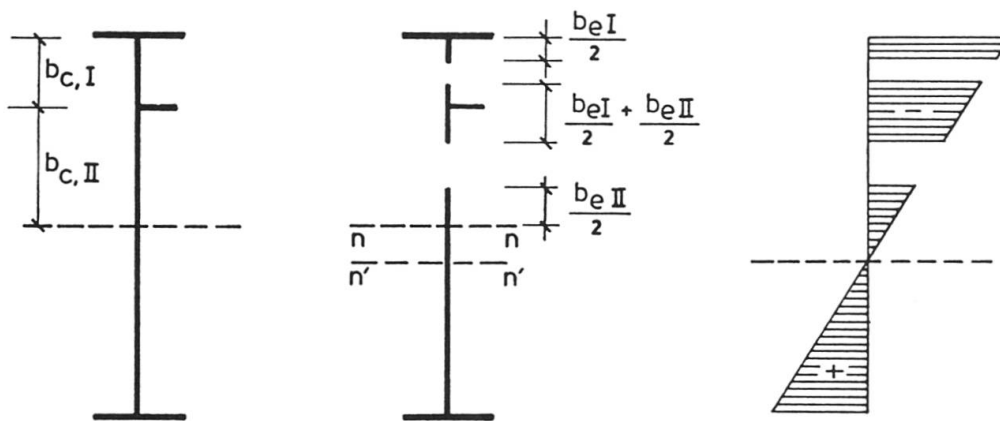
Effective width model for a longitudinally stiffened plate girder.
